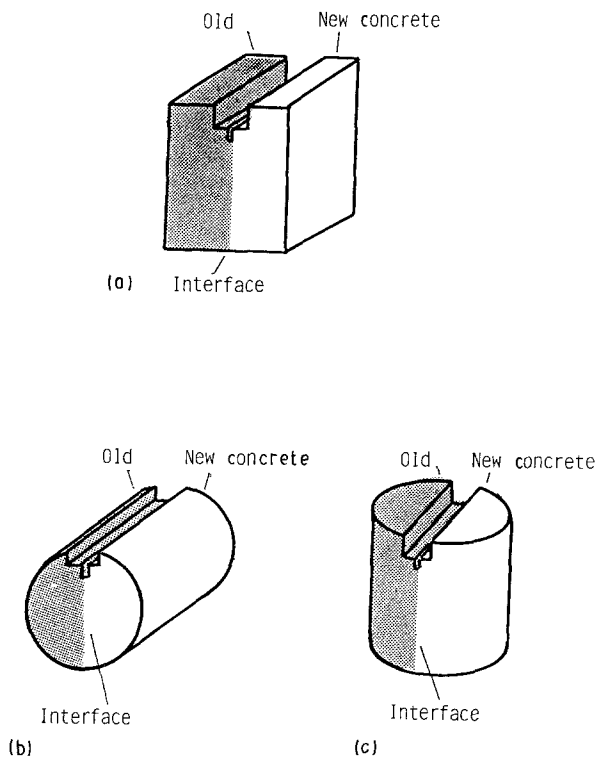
Specimen shape of a (a) cubic specimen, (b) drill core specimen in horizontal position, (c) cylindrical specimen in vertical position.
